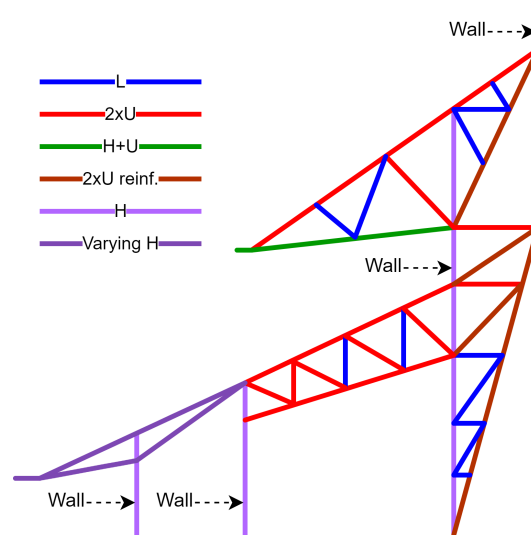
Overview of profile types and locations of walls in a truss (own work).
